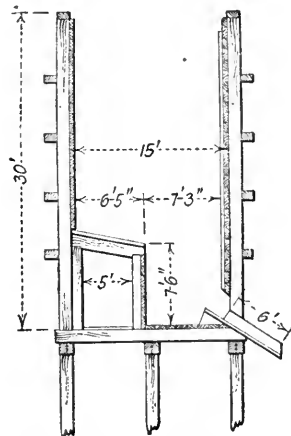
CROSS-SECTION OF BIN WITH NEW TYPE OF BOTTOM.
